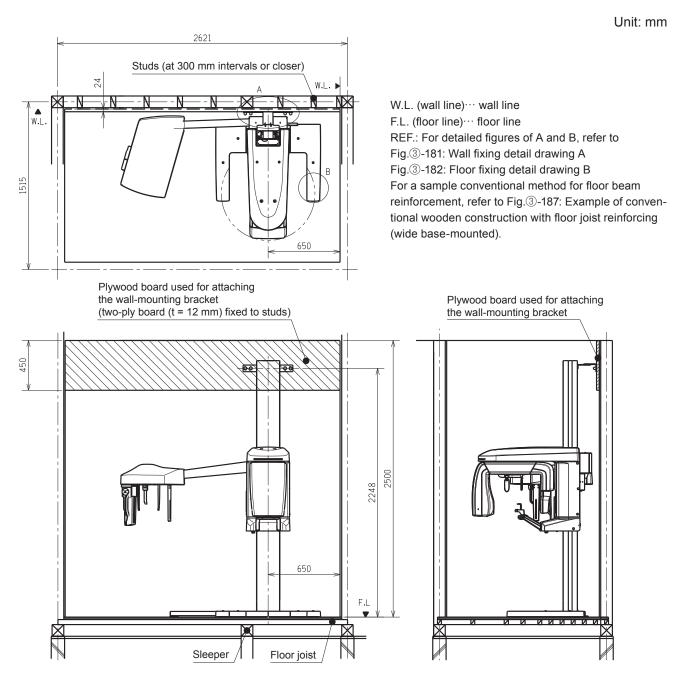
Example of fixings for a conventional wooden construction and partition wall (Standing position base-mount long type (with an optional wide base): 3D Cephalometric type)
